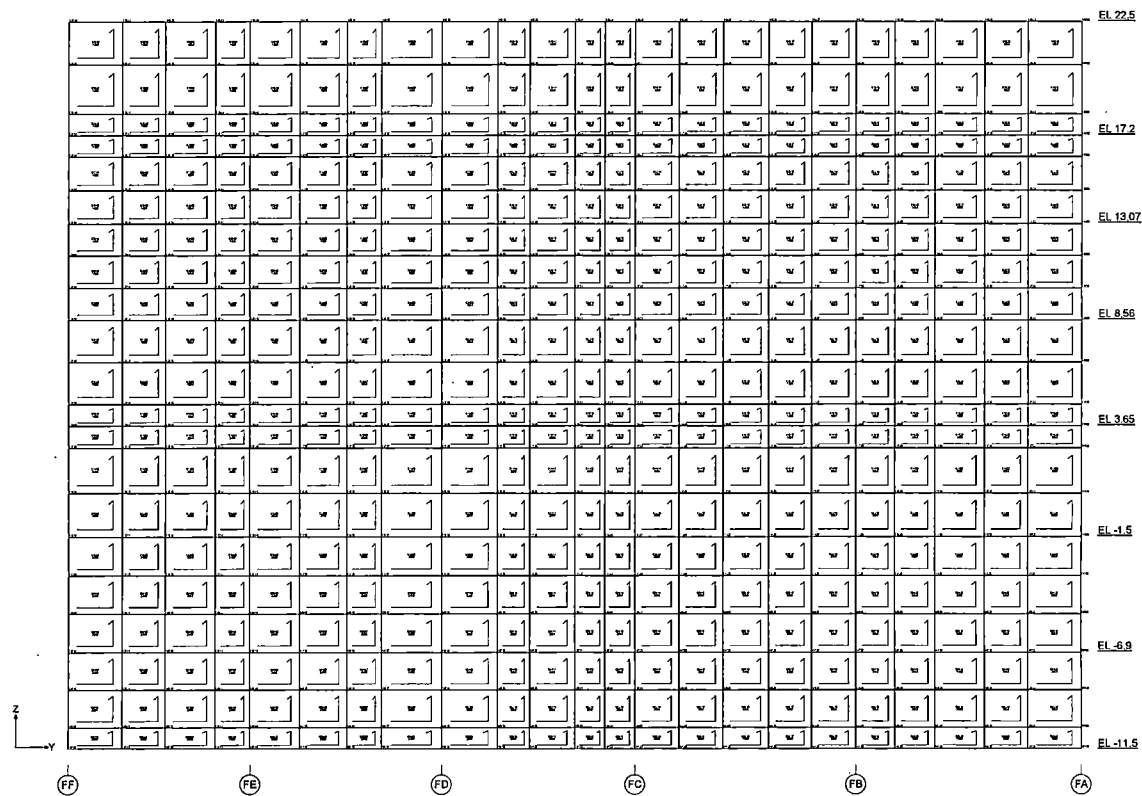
FE Model of the External Wall (F3 Column Line)
